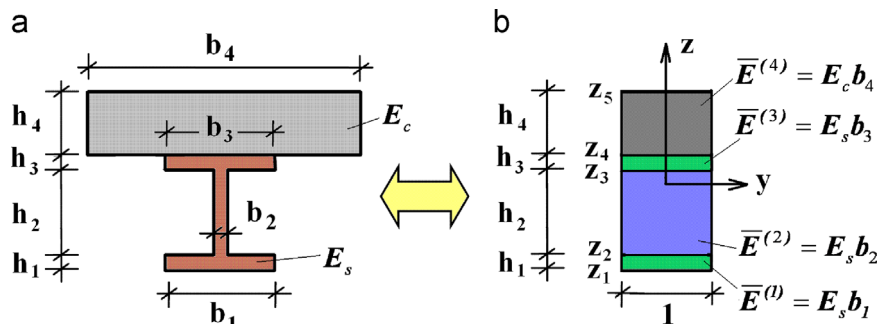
(a) Typical cross-section of the composite beam and (b) equivalent laminated cross-section of the composite beam.
